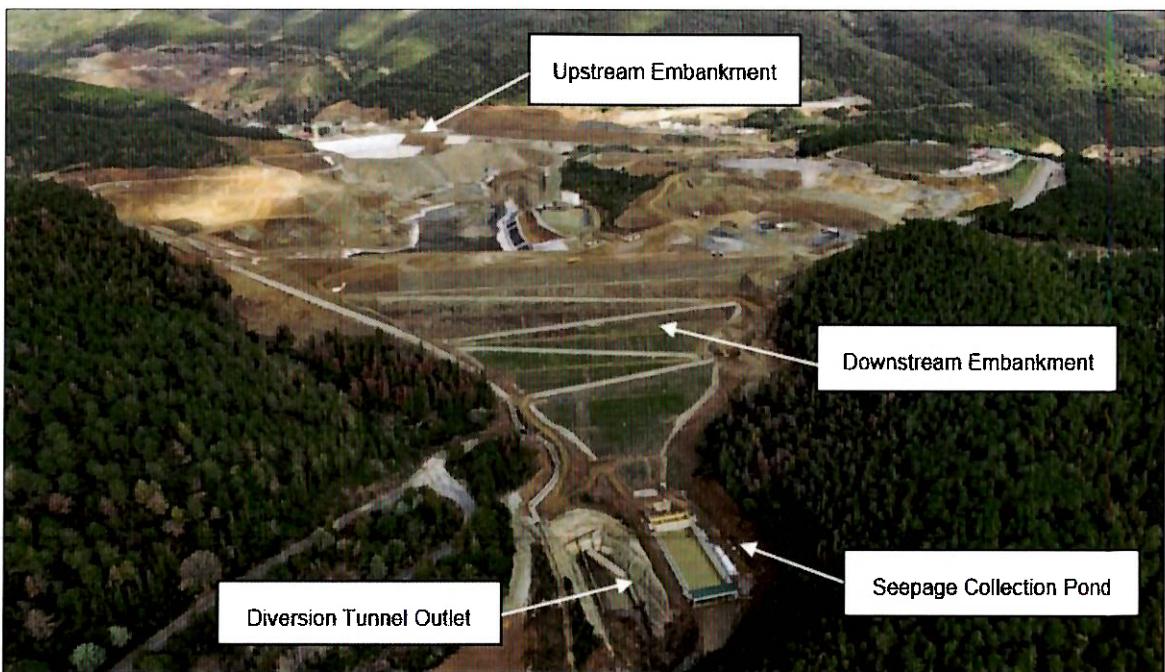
Photograph of the Downstream Embankment Seepage Collection Pond
